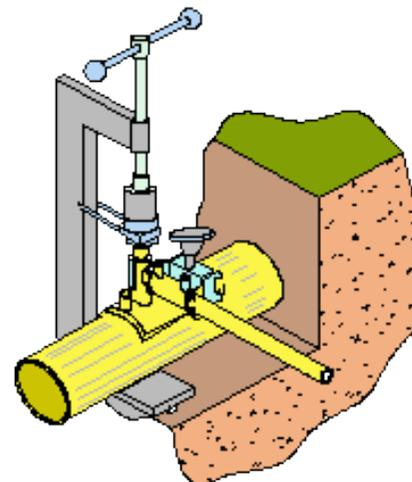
Clamping Fitting to Main & Coupler to Tee/Pipe
